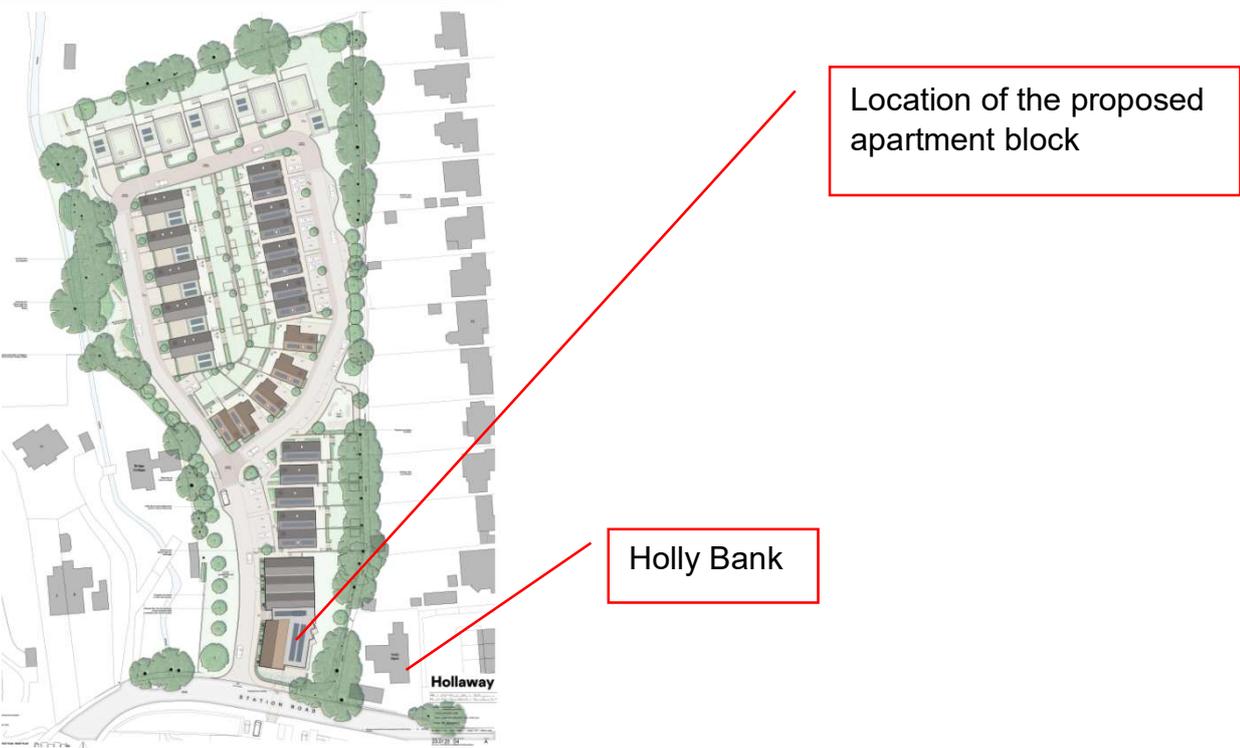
Proposed site layout and relationship of apartment block with Holly Bank
